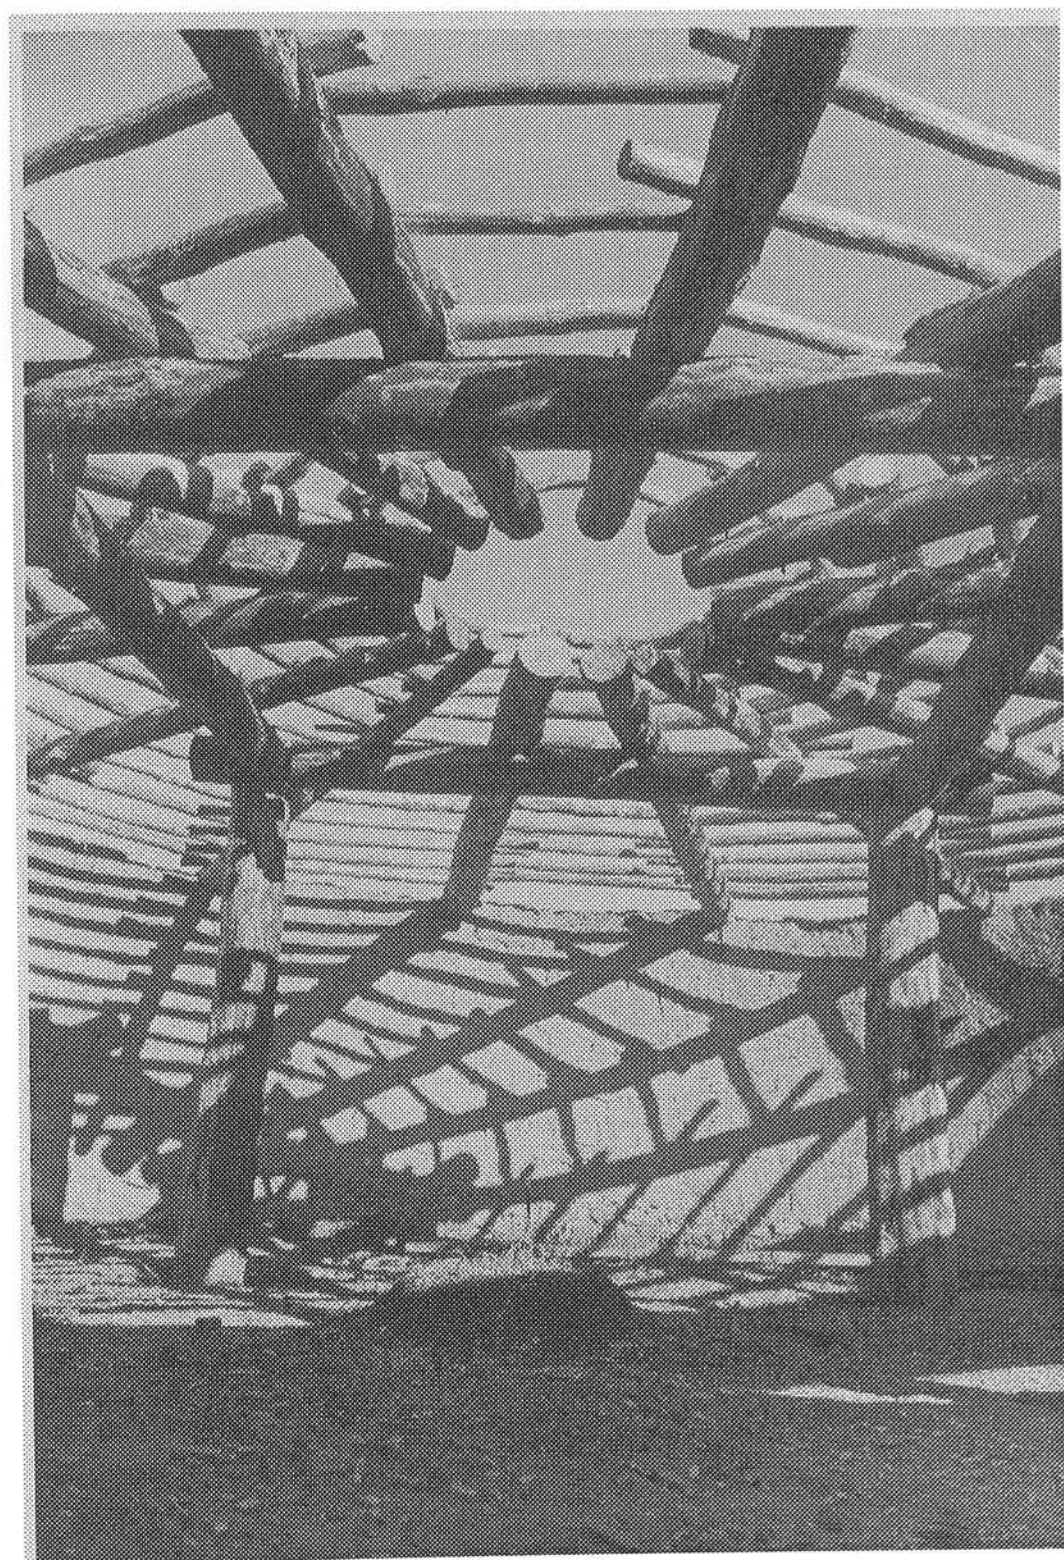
LEV, RH1 interior view of roof timber arrangement.
